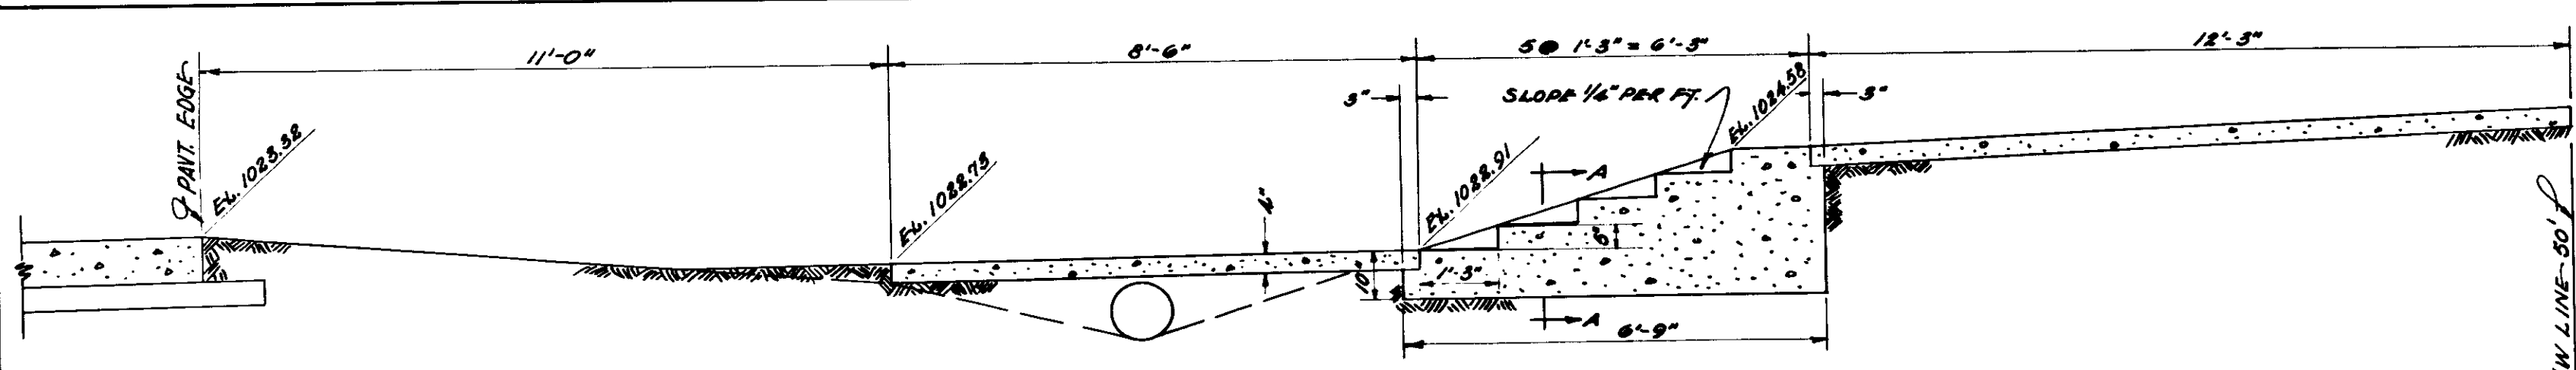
DETAIL OF CONCRETE WALK & STEPS LT. STA. 586+77.5
